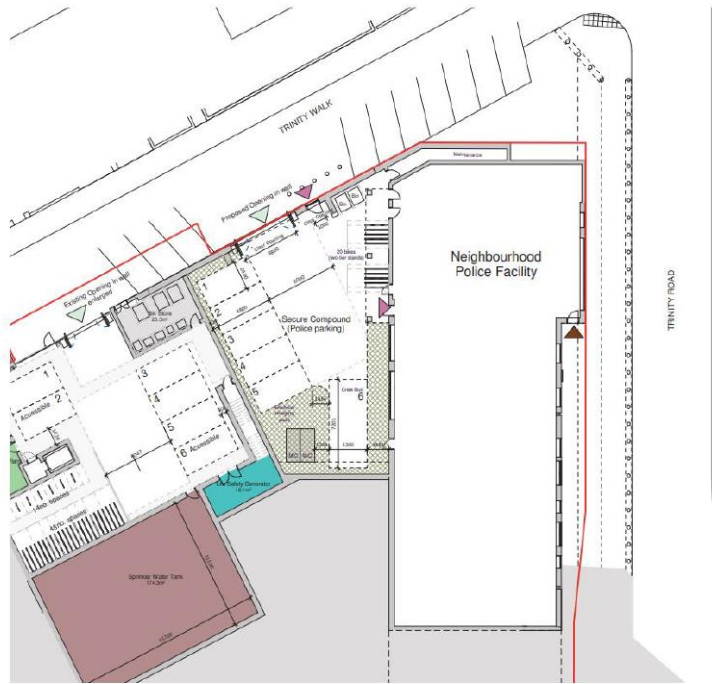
Proposed Police Facility taken from applicants Design and Access Statement
